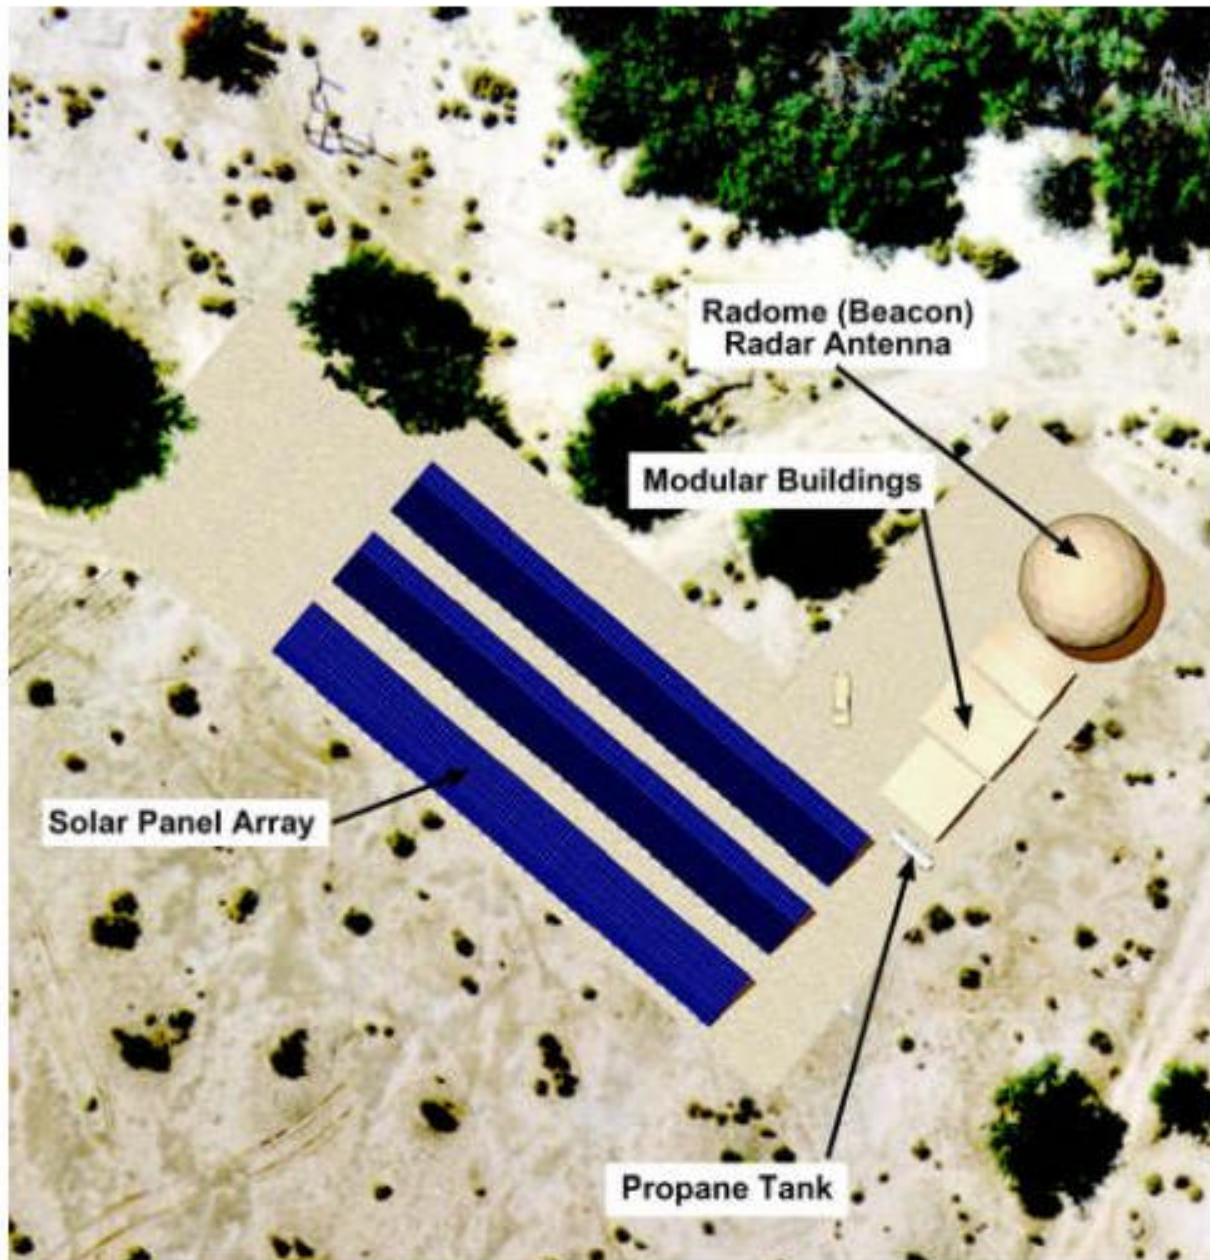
Conceptual Site Plan – Beacon Radar
